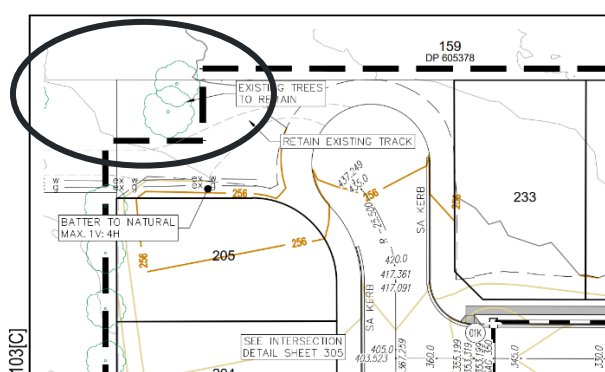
Draft detailed subdivision plan demonstrating surveyed tree locations and indicative proposed exclusion area from Tree No.s 72, 73 and 74
